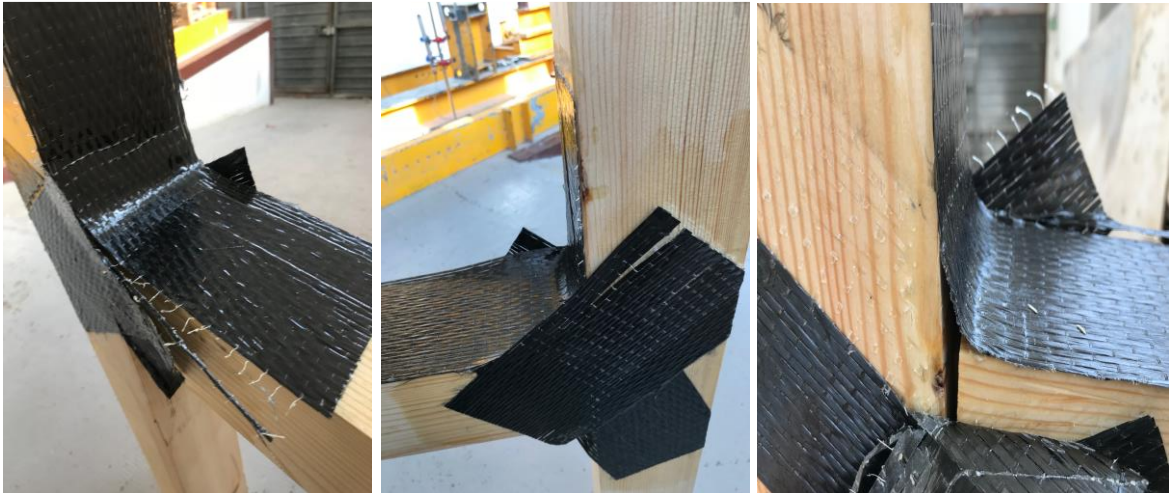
78: The modes of failure for three reinforced specimens under cyclic loading
